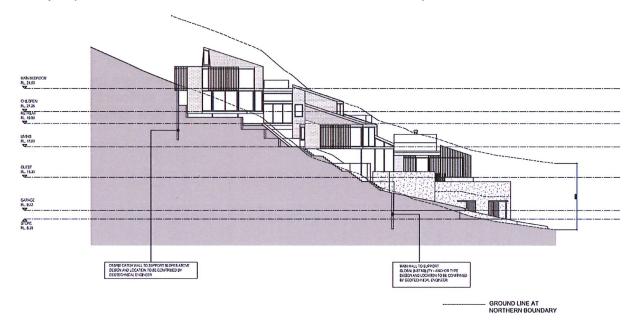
Figure A: North Elevation drawing RC2.01 (source: Robin O'Donnell Architects concept dated December 2023).
